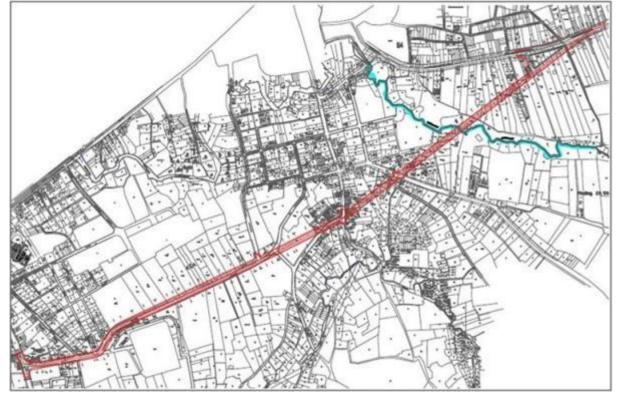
Layout & Profile of the Proposed Improvement & Extension of Tran Quy Cap Road
